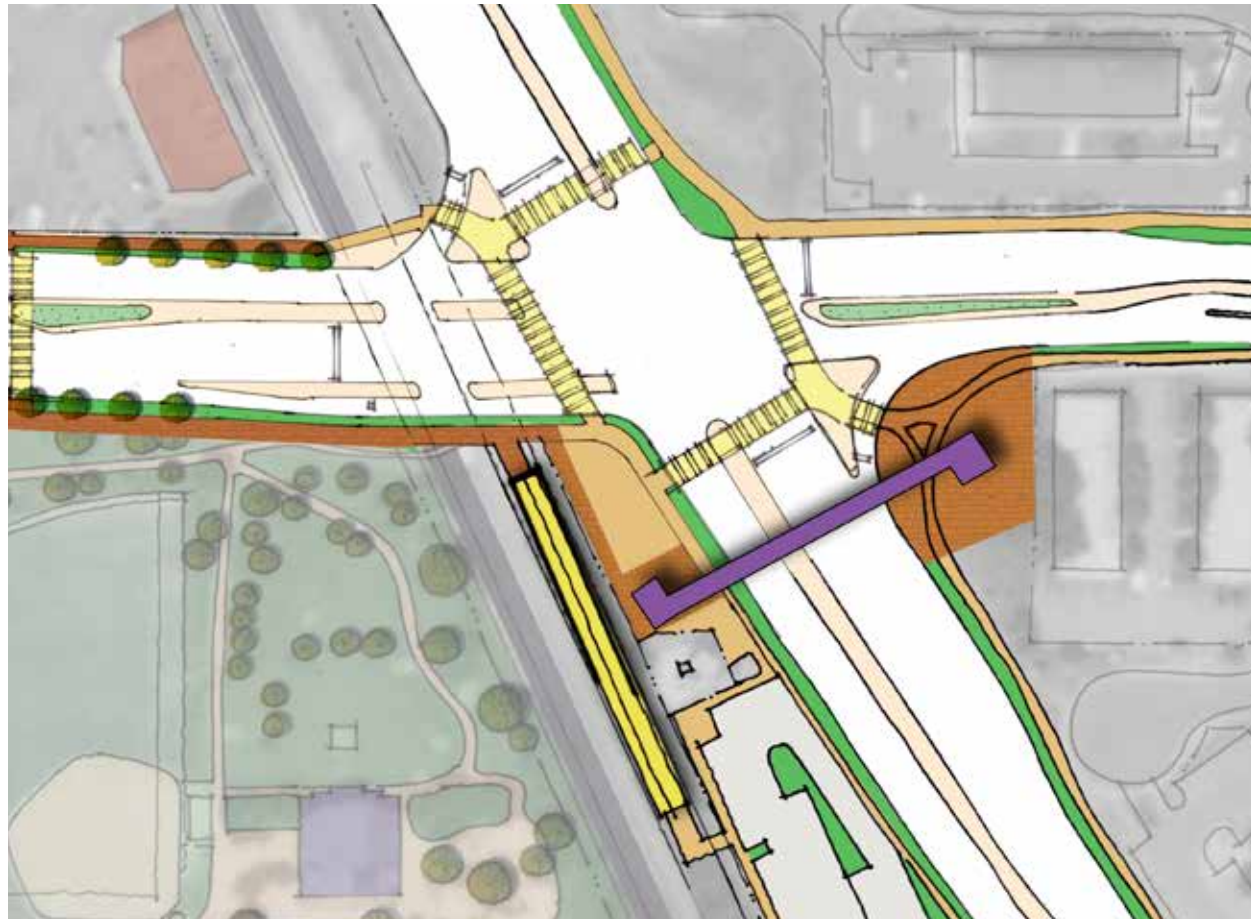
PLAN OF CONCEPT PEDESTRIAN BRIDGE
